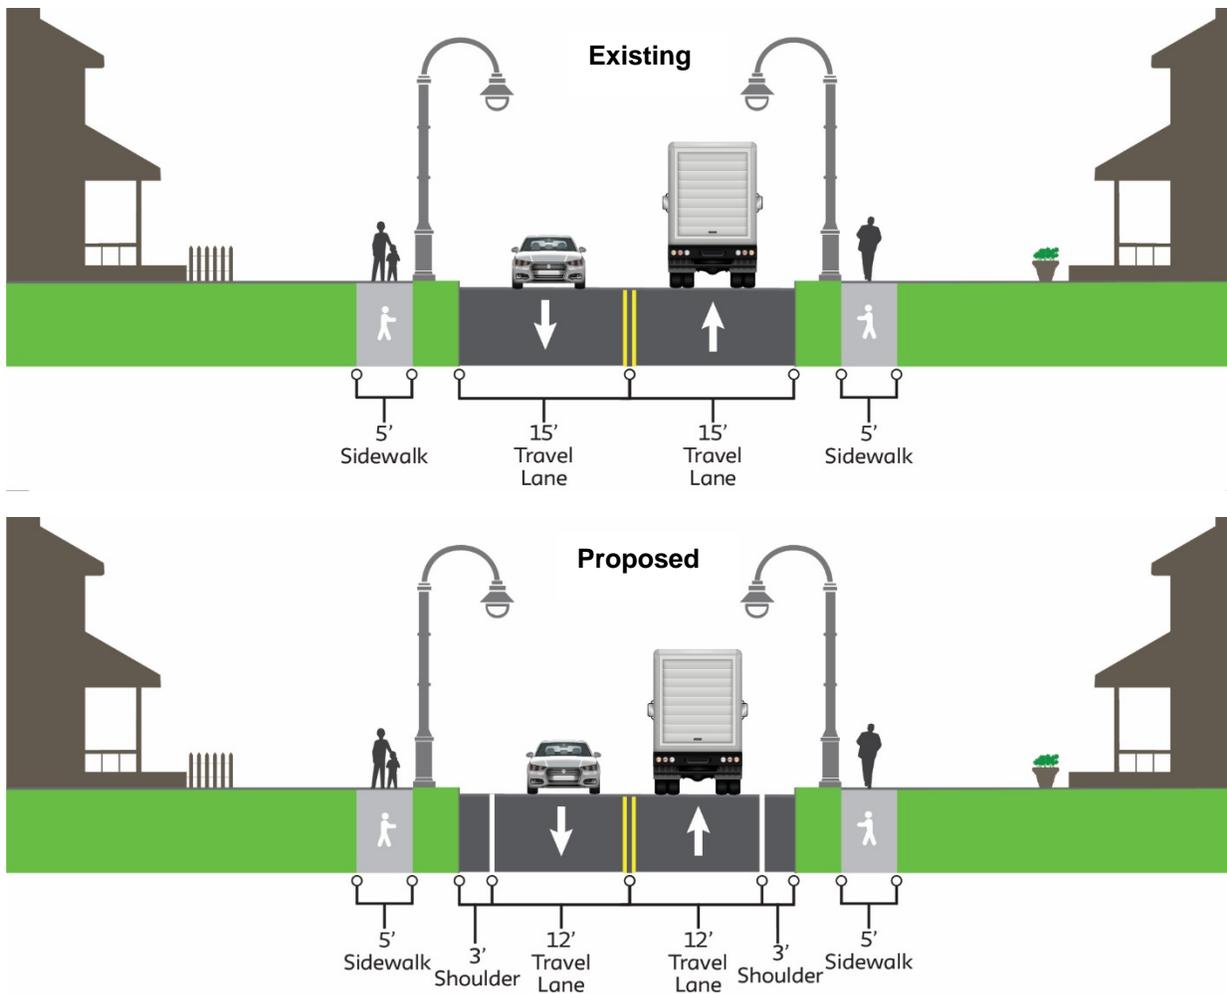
CR524 (South Main Street) between Conines Millpond Bridge and CR524 (Yardville Allentown Road)
